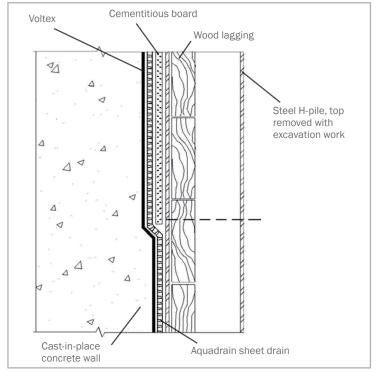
WALL EXCAVATION AT GRADE - Cementitious board protects waterproofing during excavation and removal of steel pile top and wood lagging.
